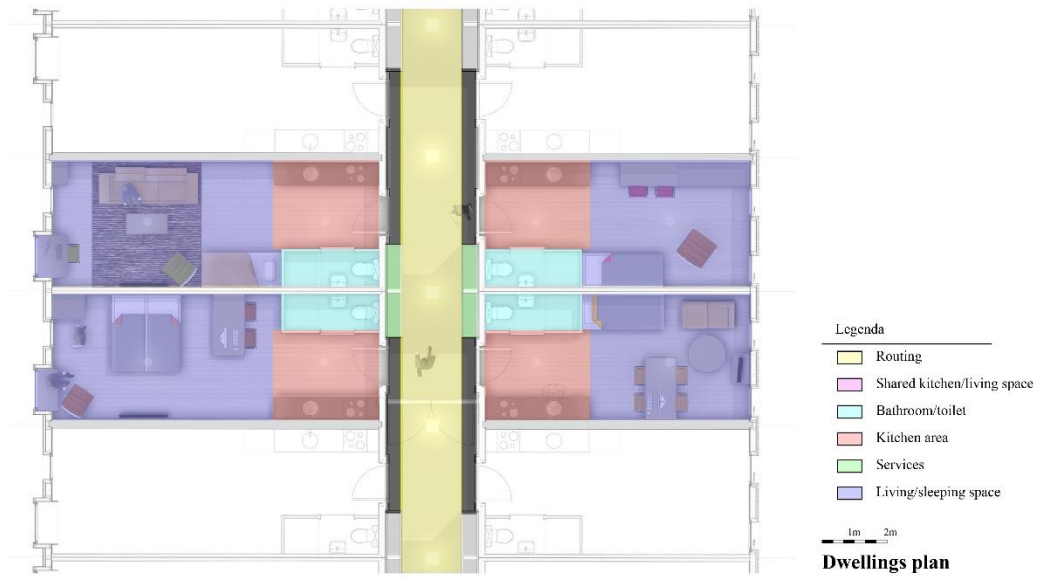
Röntgenweg case study analysis dwellings plans (Studentenhuysvesting Spoorzone | Leeuwenkamp Architecten, n.d.)
